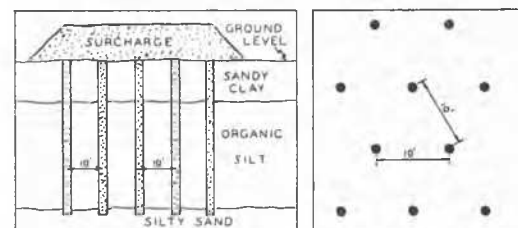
Cross Section of Sand Drains and Surcharge Fill. Plan of Sand Drain Pattern
